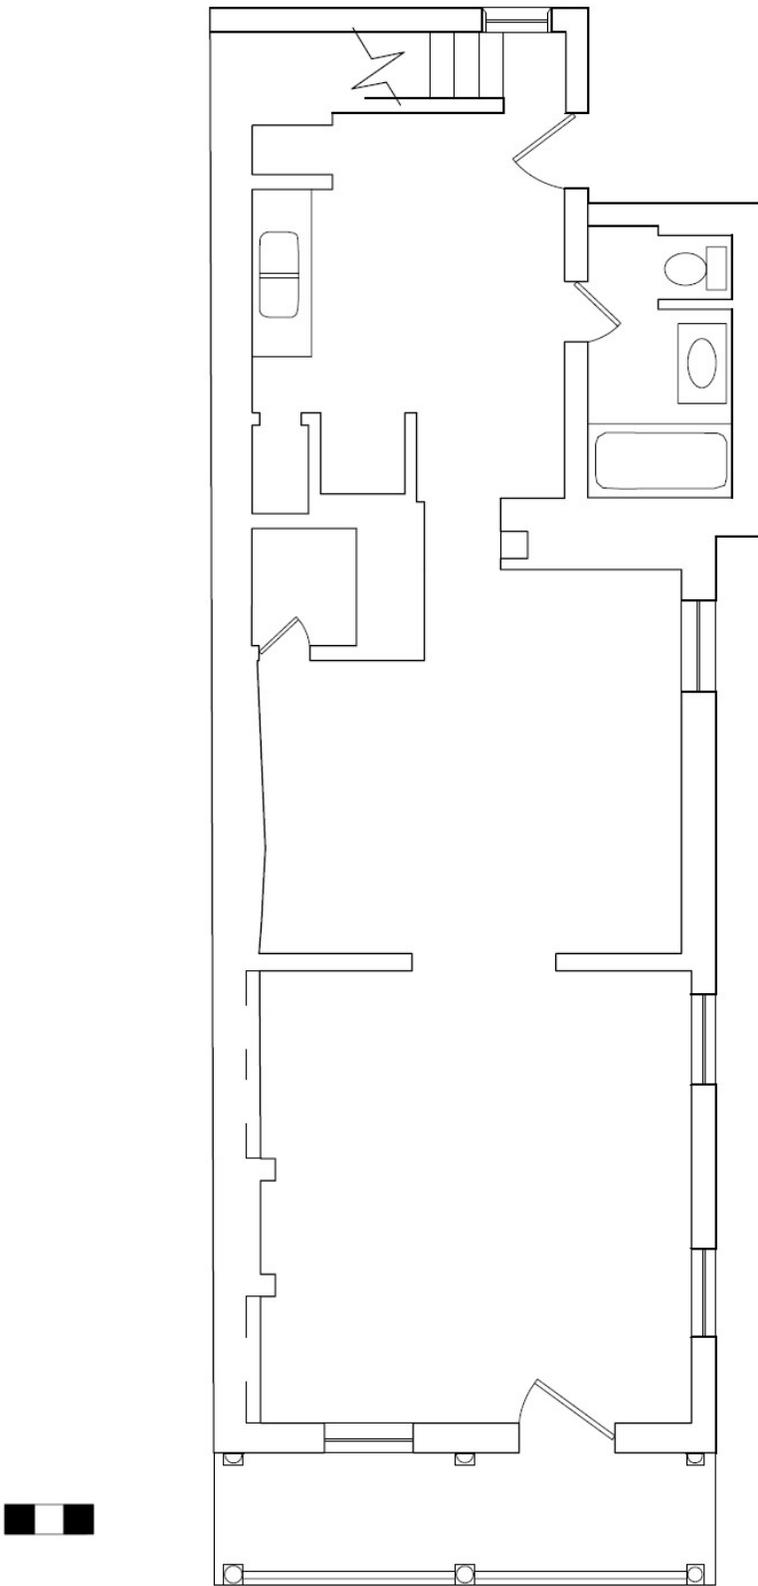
507 West 12th St, Main floor plan, Drawn by Bill Macintire and Danielle Jamieson, scale in feet.
